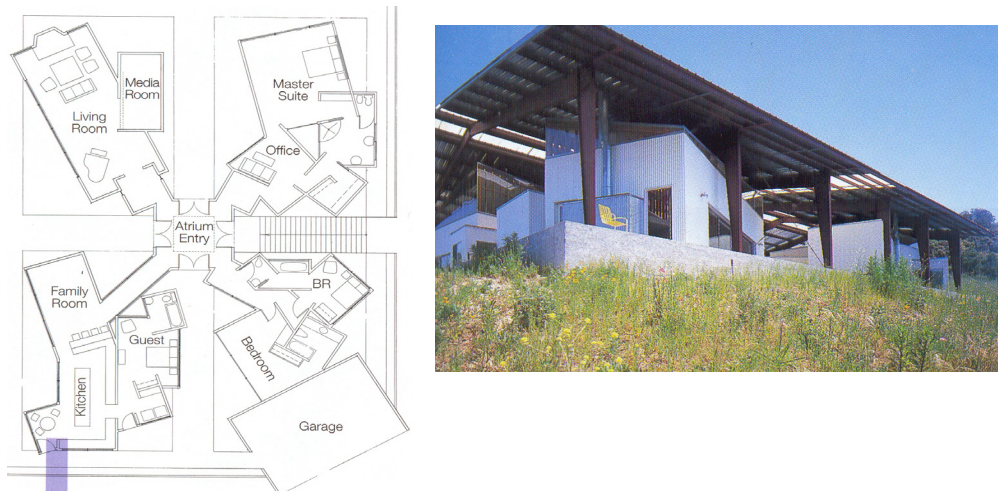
Hot rolled frame, Brian Murphy, arch. Topanga Canyon, L.A., 1998
